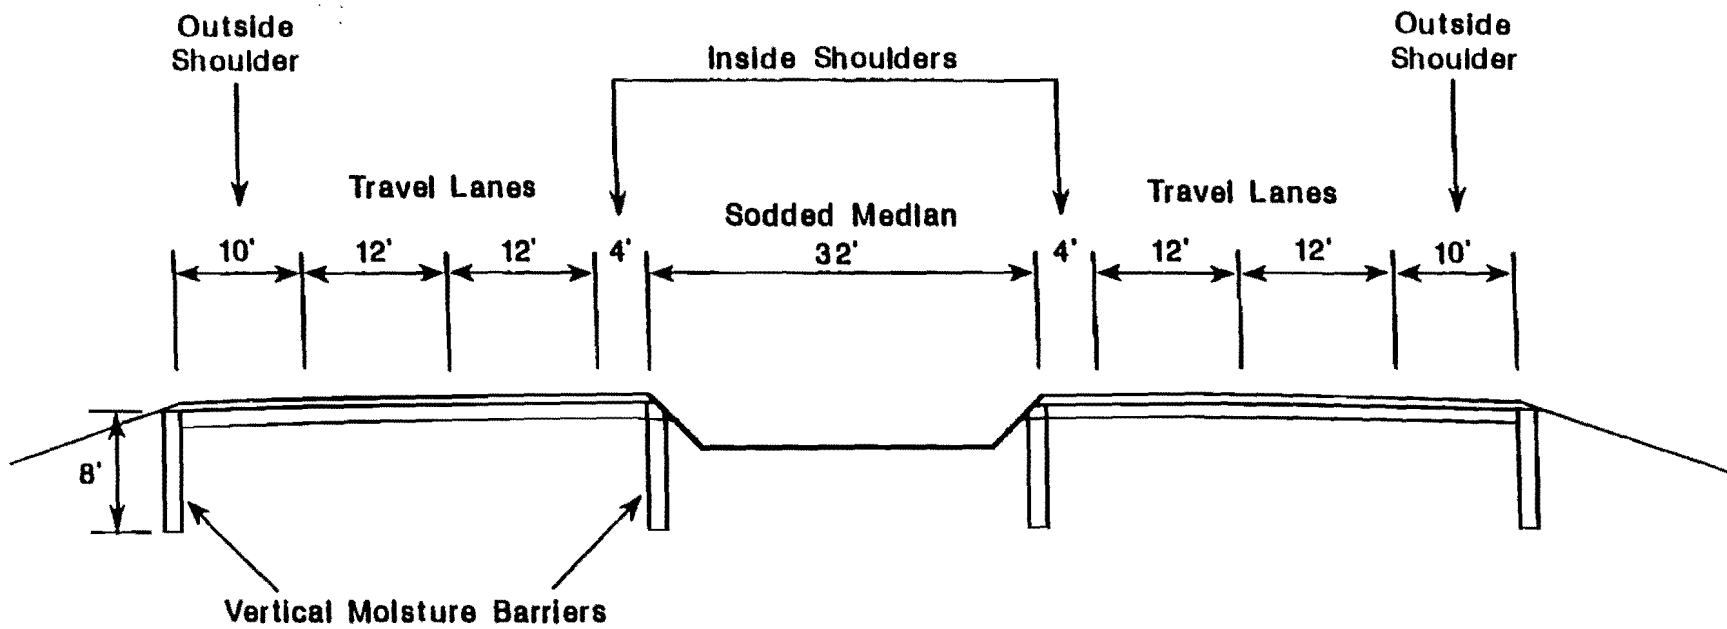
A Typical Cross Section of a Pavement with Vertical Moisture Barriers
